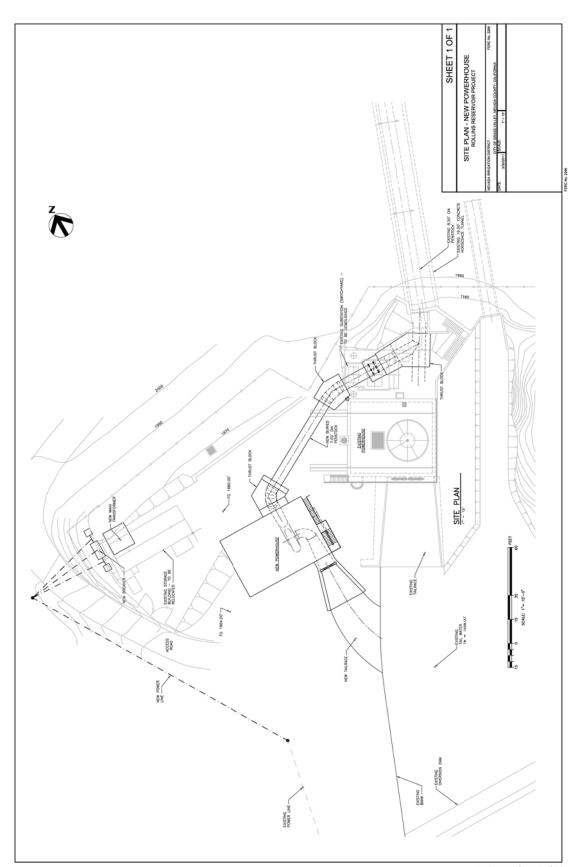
Conceptual site plan of the proposed Rollins No. 2 Powerhouse (existing Project features shown in grayscale).
